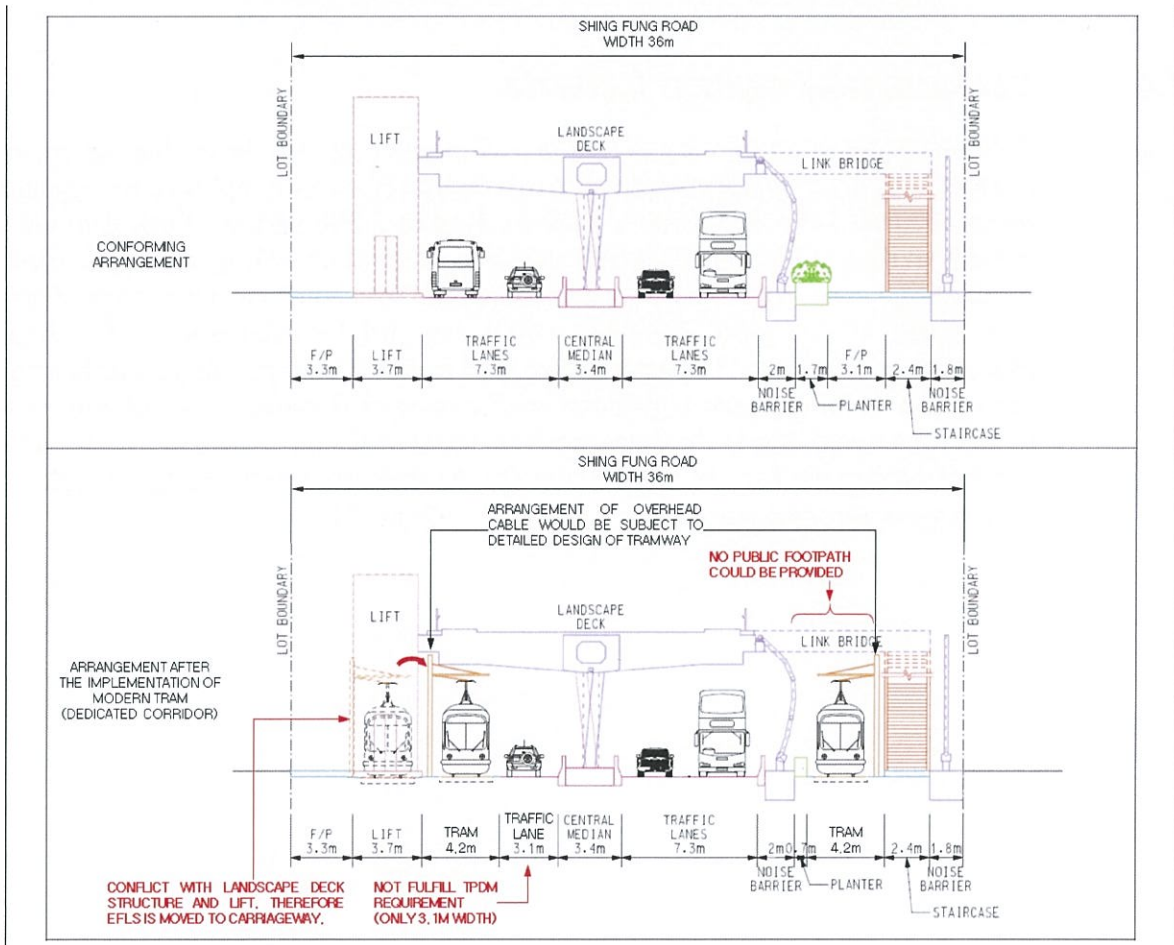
Typical Cross Section Plan of for Option 1 (At-Grade Dedicated Corridor) on Shing Fung Road (Before and After Implementation)
